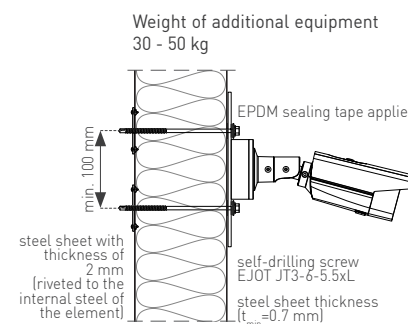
Fastening through the panel to a 2 mm steel sheet with screws.
